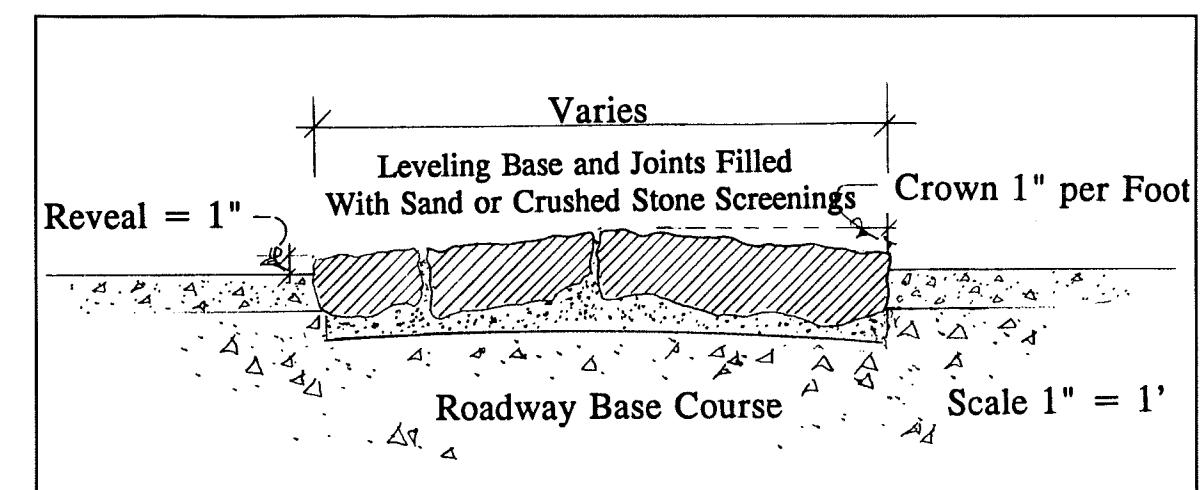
Masonry paved median, cross-section. Drawing by OCLP.
